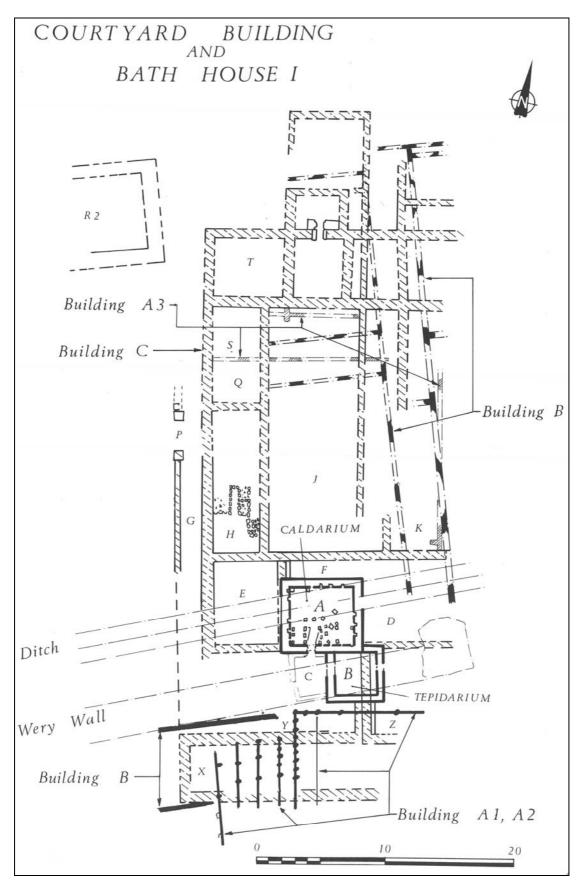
Overall plan of the courtyard buildings and bath house overlain by the Wery Wall (Jones *et al* 1988)
